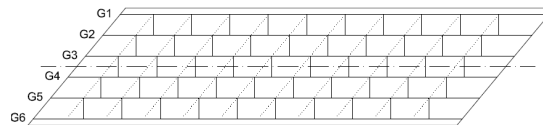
Staggered cross-frame arrangement of Bridge 18.
